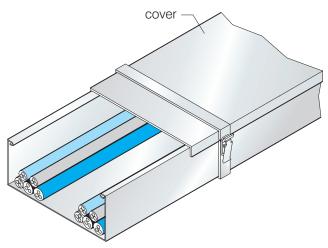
Flat bottom cable ducts have a shielding effectivity. The shielding attenuation can be enlarged by the use of covers.
